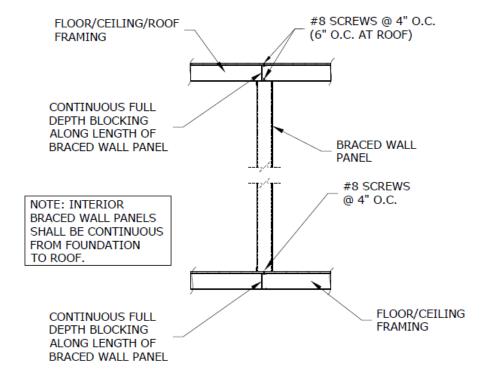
Braced Wall Panel Connection Perpendicular to Roof/Ceiling/Floor Framing
